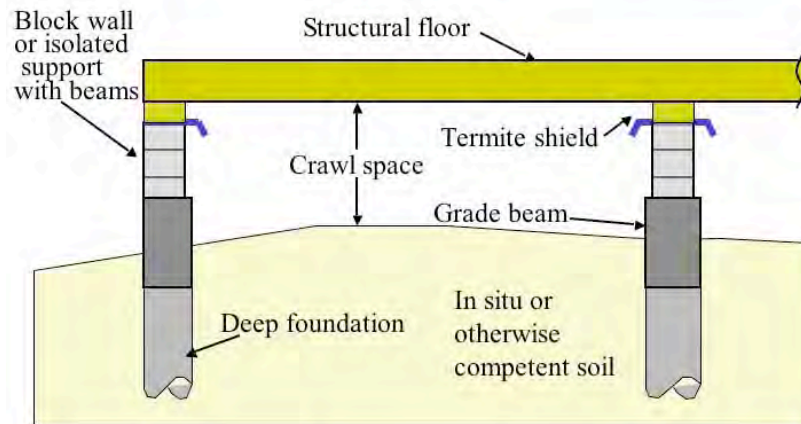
Structural Floor with Crawl Space and Deep Foundations
